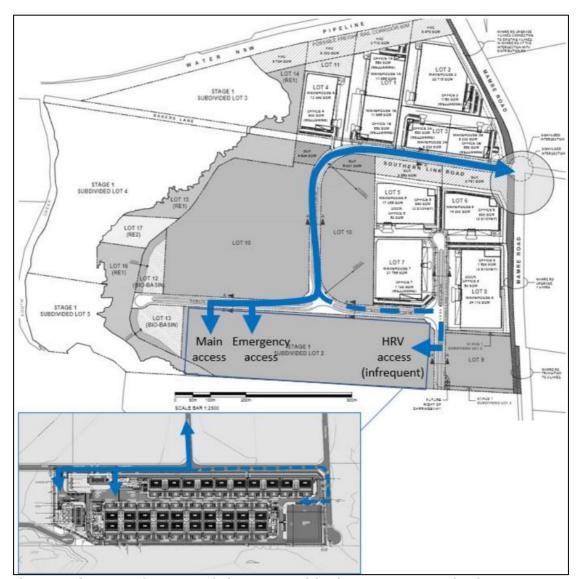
Site Access from Upgraded Mamre Road / Bakers Lane Intersection (Source: ARUP, 2021)
